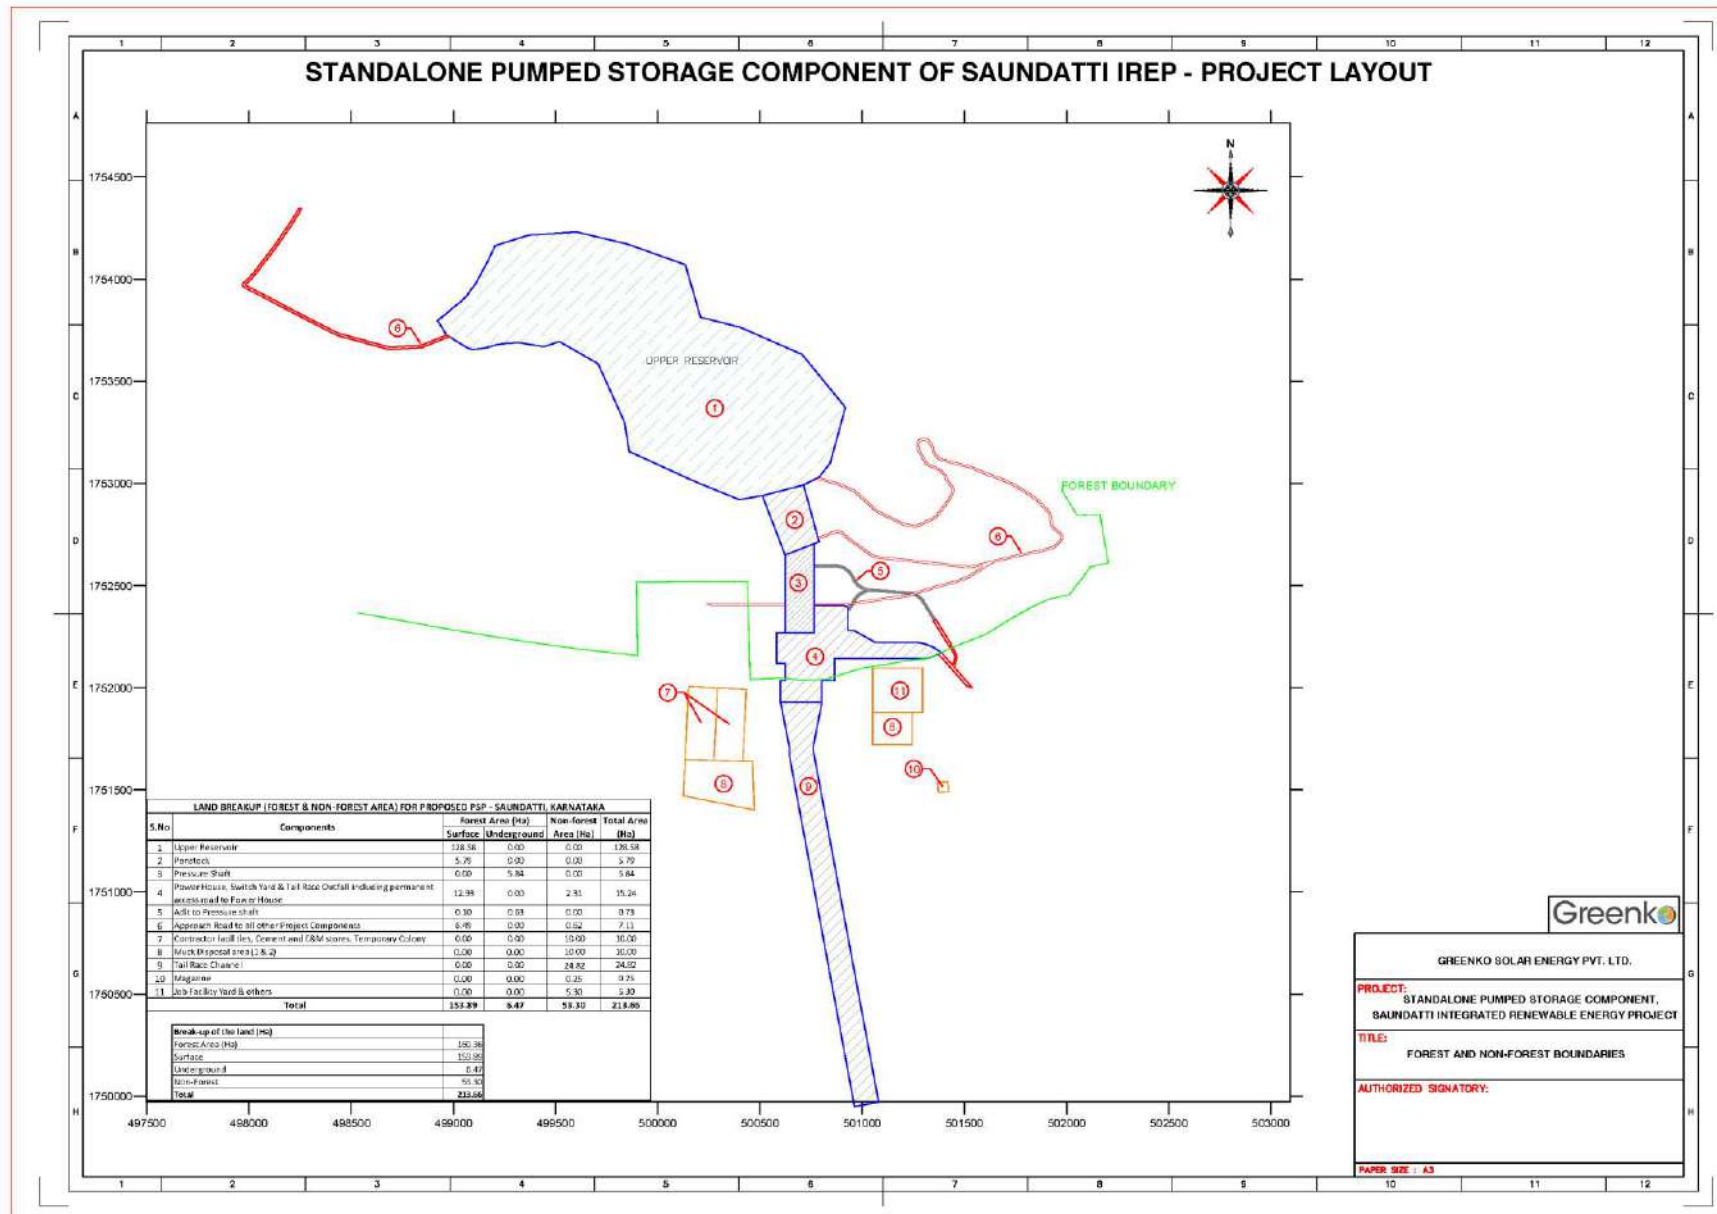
Layout Plan of Pumped Storage component of Saundatti IREP showing location of muck disposal sites
